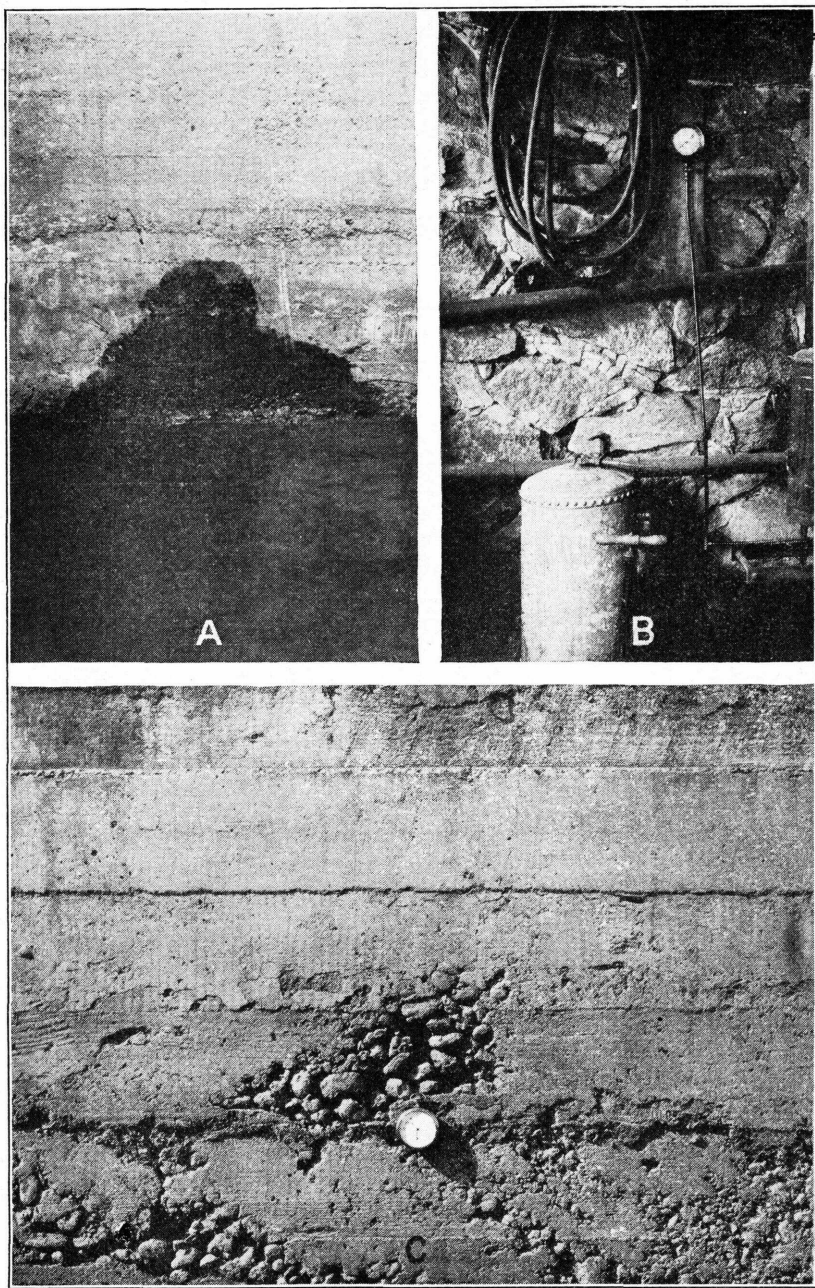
Poor construction and water-tightness are incompatible; A, Water finds the weak spot at junction of floor and wall; B, rough rubble wall; C, poorly spaded honeycombed concrete wall
